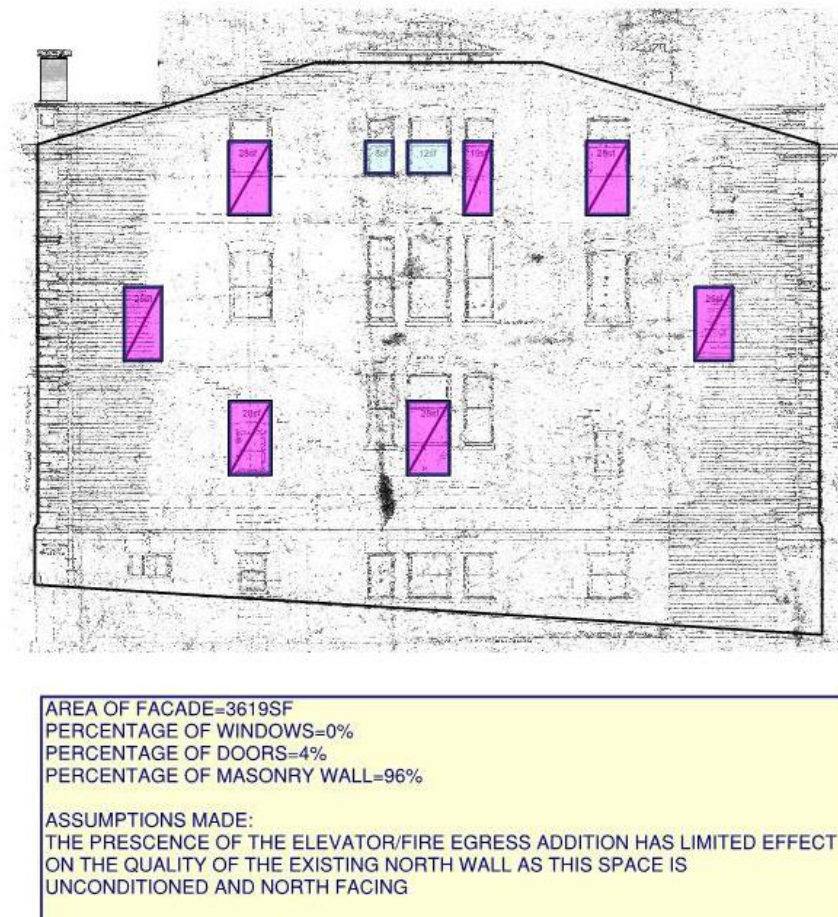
North Elevation (Derived from Original Drawings by Architect)
